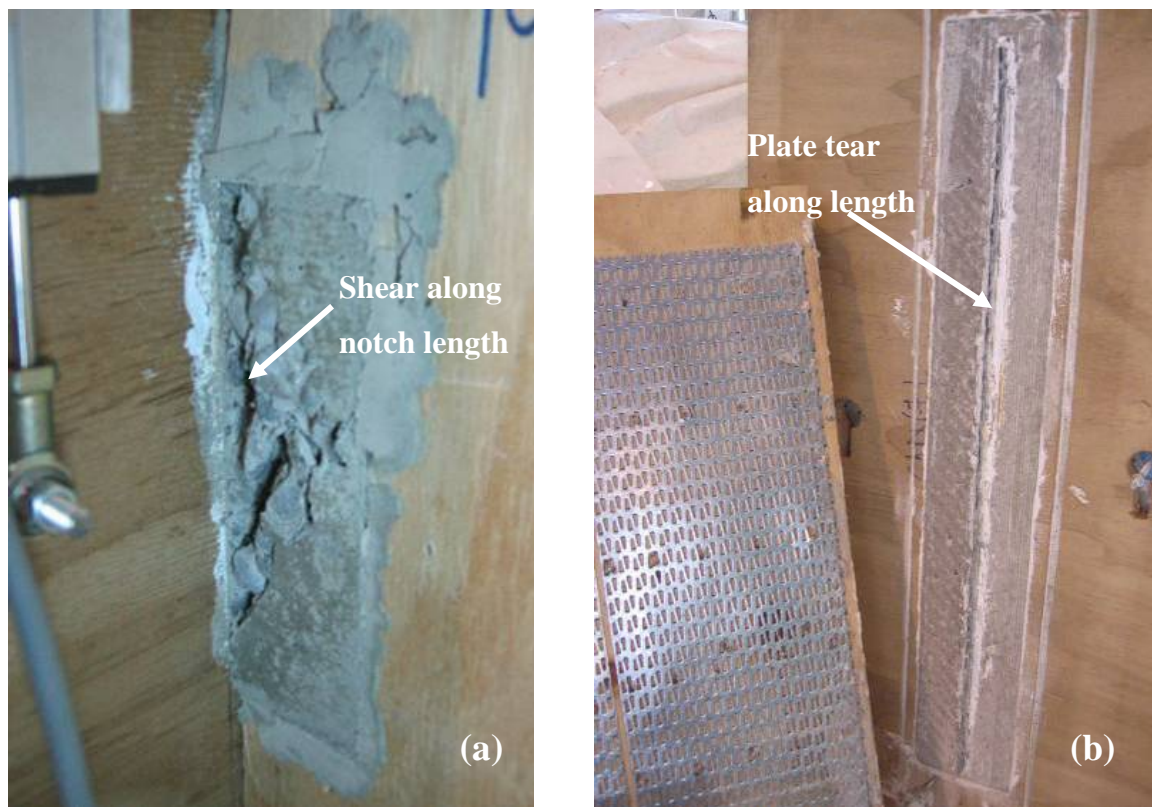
(a) Rectangular notched connection failure – shear in concrete length, and (b) Toothed metal plate connection failure – plate tearing along length of plate
